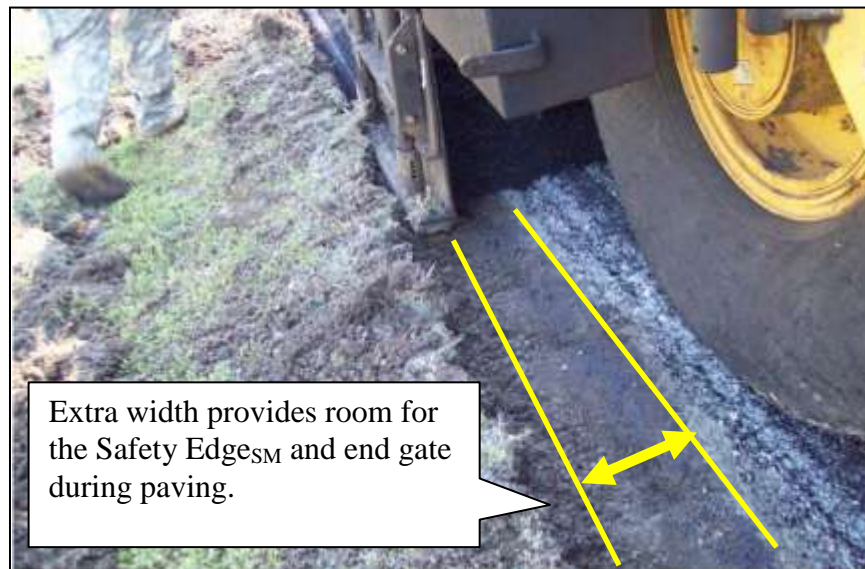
Extra width created by preparing the existing pavement edge/shoulder.
